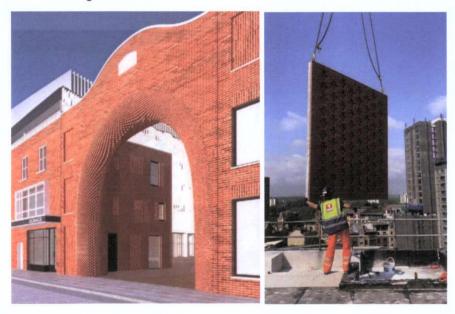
Moore Street Archway & Typical Precast Panel Installation
